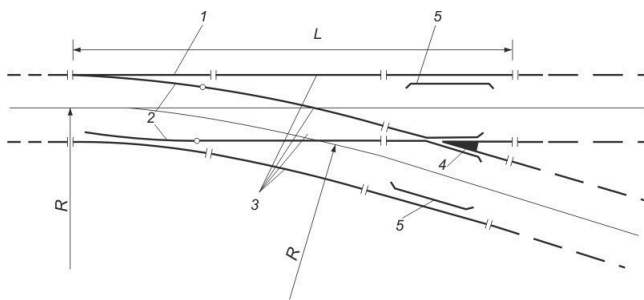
Ordinary railroad switch: 1 – stock rail, 2 – blade, 3 – connecting rails, 4 – frog, 5 – guard rail, L – length, R – radius
